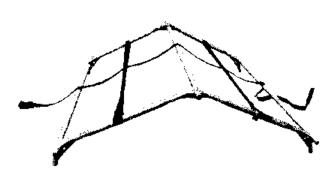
Insulation roof restraints fitted and support straps placed across frame
